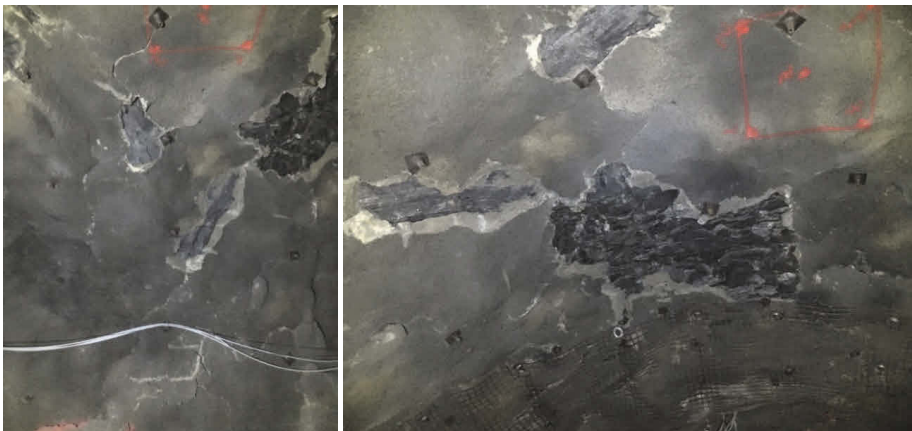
Damage propagation from RS into roof (left) and across roof (right).
